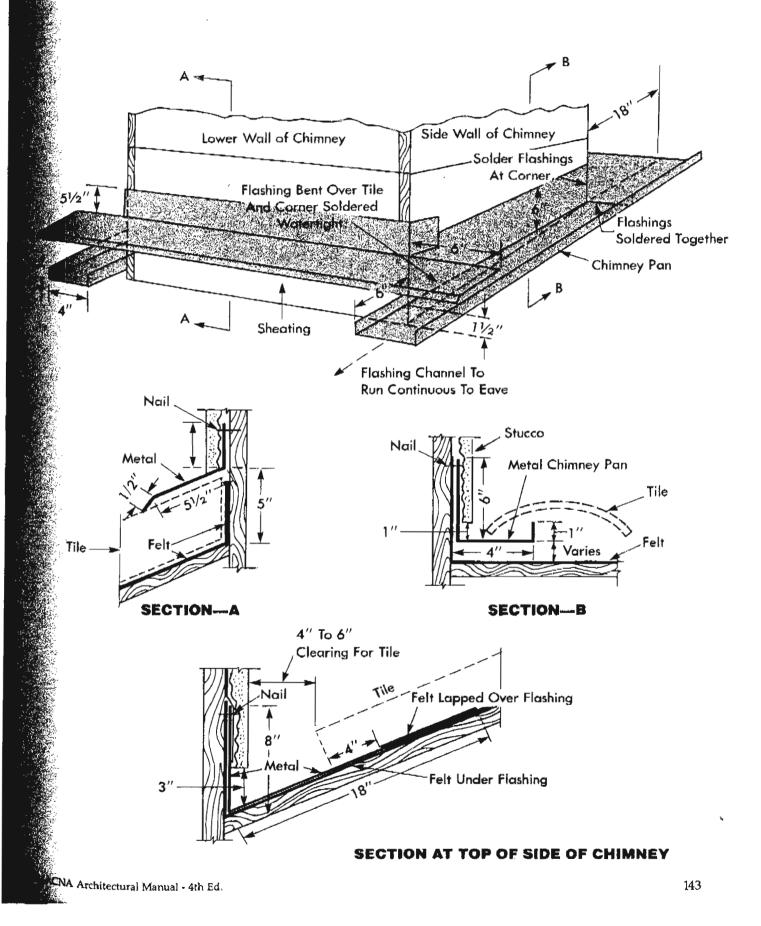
shows a method of flashing a stucco chimney in a tile roof. Tile manufacturers may have specific requirements or recommendations that deviate from these details. Modification would be necessary for any area with more than light snow accumulation. Flashing pieces must be assembled in a waproof manner. A cricket would be needed wide chimney and top side details would be mified accordingly. Pans that run by sides of coneys must continue to the eave. Building performed to the chimney would lap over the mission flashings.
